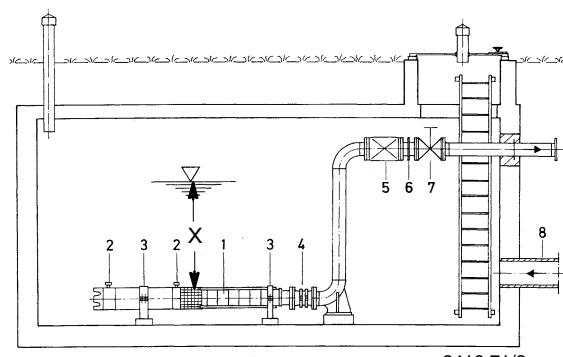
Horizontal installation (in tanks, mine shafts etc.)
